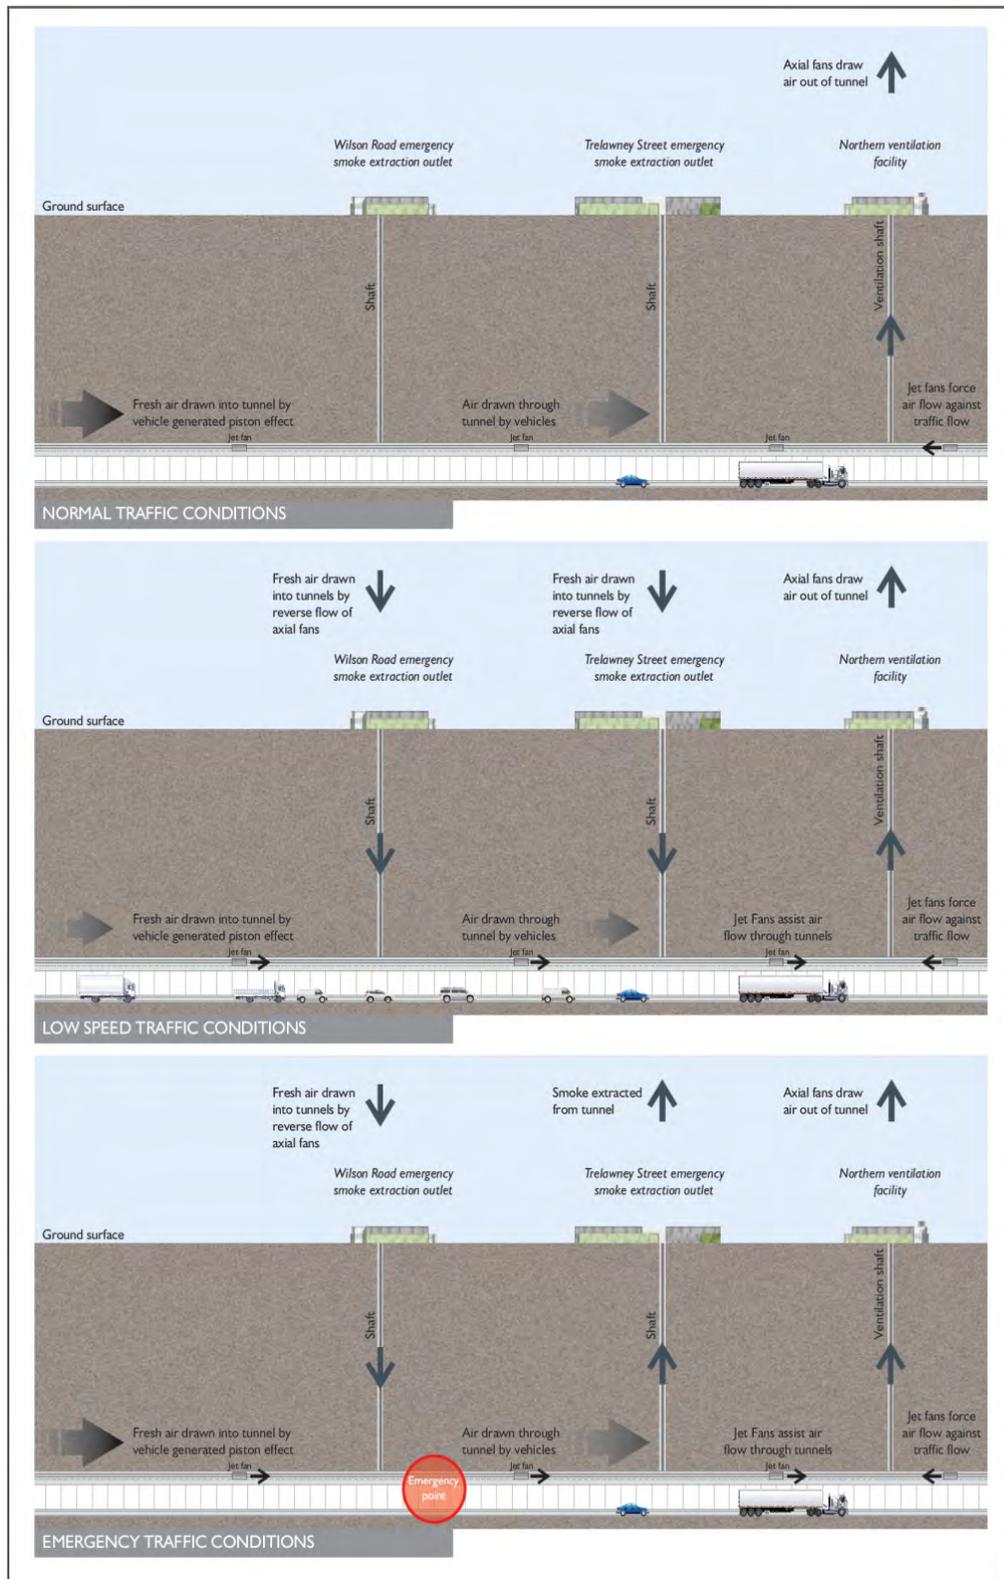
Indicative tunnel ventilation system (northbound tunnel arrangement) (source: EIS)
